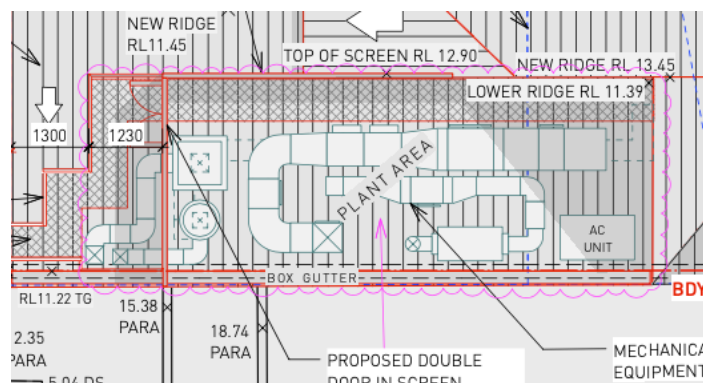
, Roof Plan: Mechanical ventilation equipment revised to suit kitchen exhausts – to mechanical engineering specifications. All behind acoustic screening.
